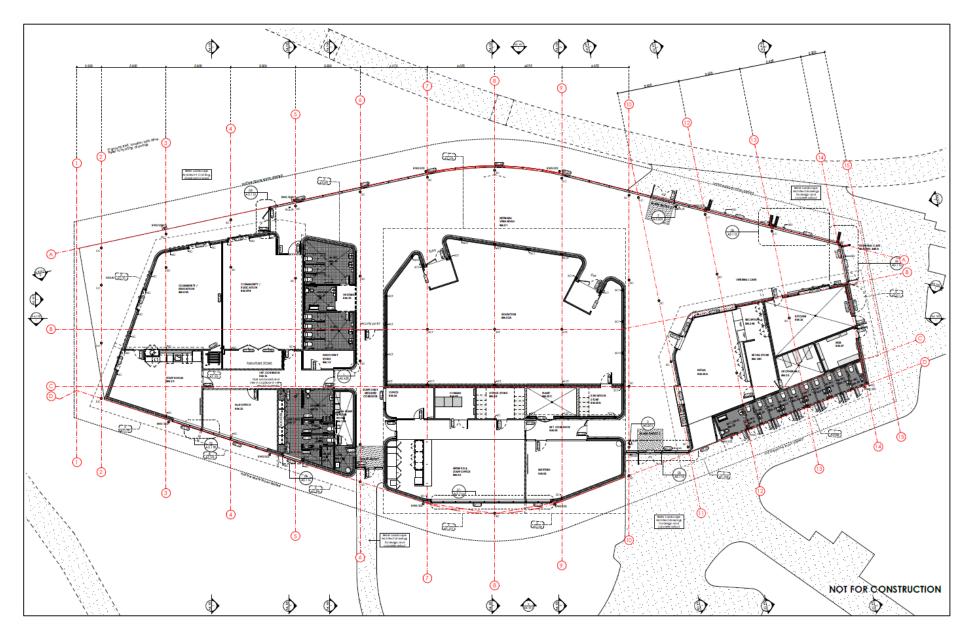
Visitor Centre Site Plan (Neeson Murcutt + Neille, 28/04/2023)
